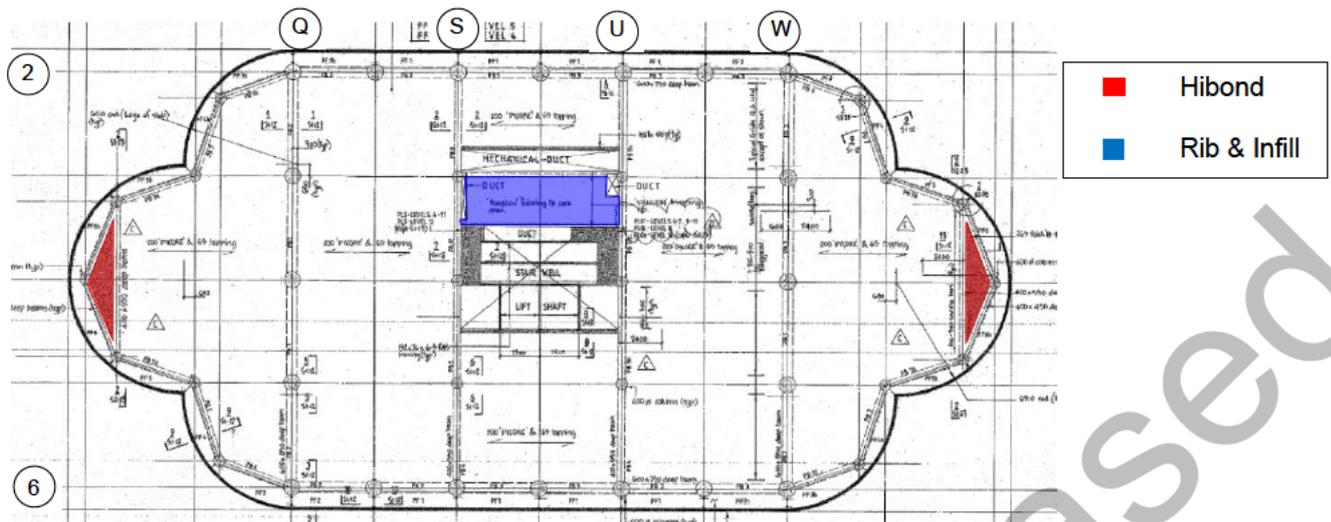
Location of Rib and Infill flooring and Hibond
